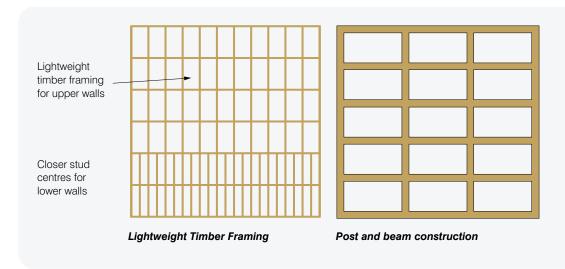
Schematic comparison of timber frame and post and beam construction.
